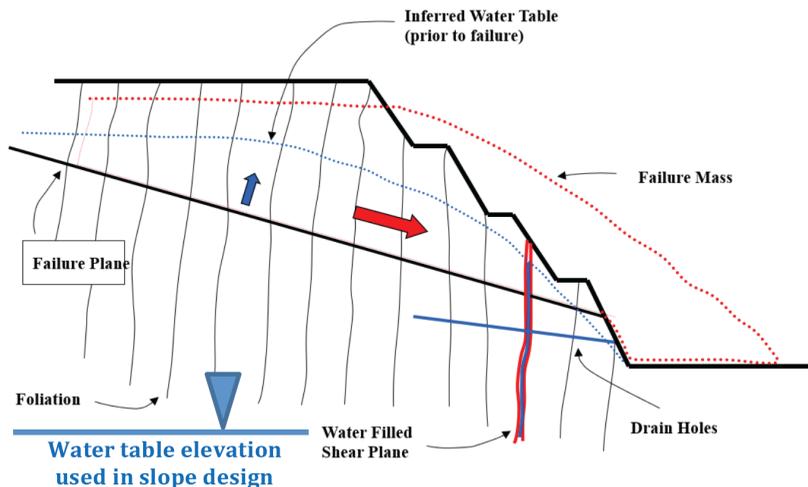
Diagrammatic section showing slope failure and groundwater assumptions
